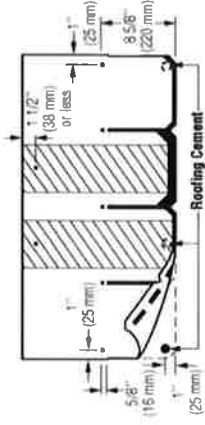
When installing Grand Manor Shangles on steep slopes, use seven nails and three spots of asphalt roofing cement.
